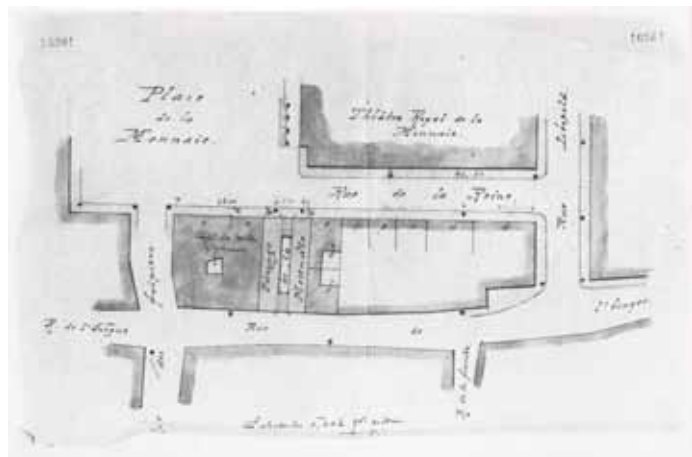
Sketch of Passage de la Monnaie in Brussel, not signed, c.1820
